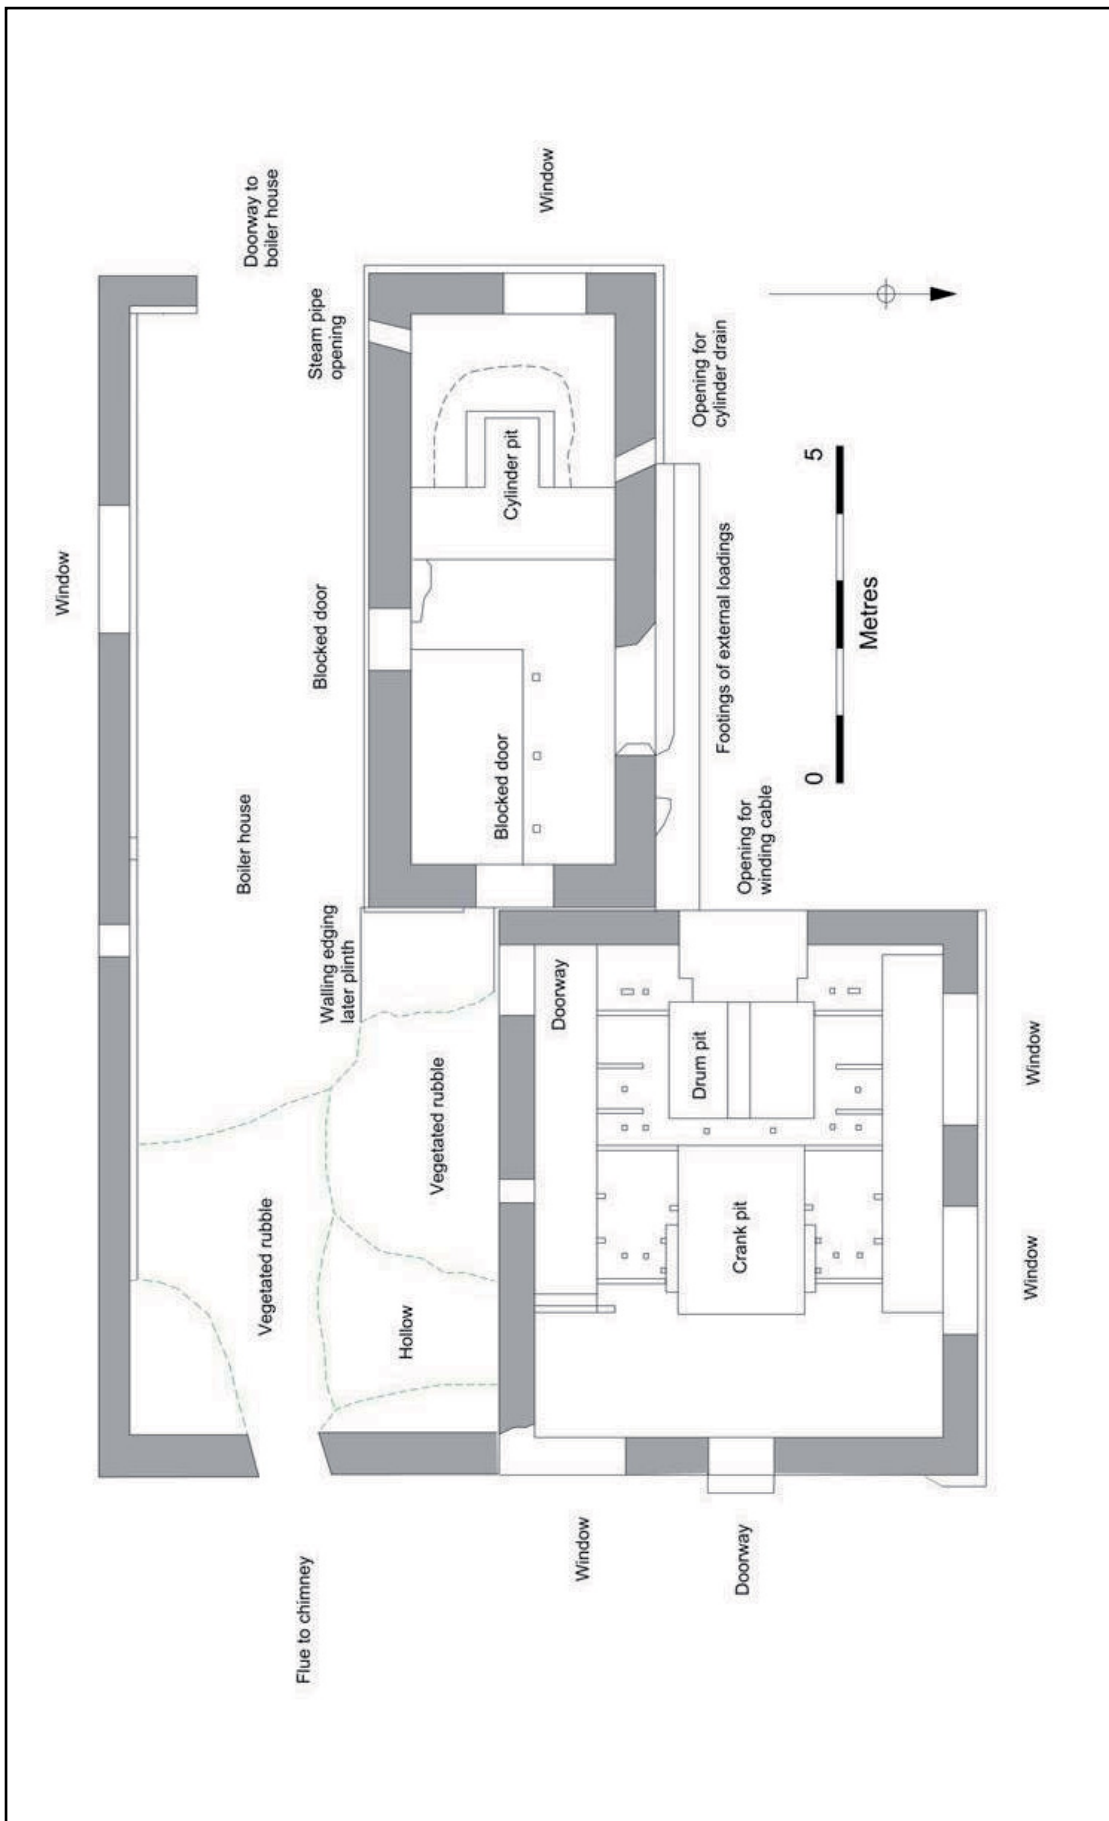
Plan of horizontal winding engine house [190376], boiler house [190377] and all-indoor beam whim engine house [190378] at Wheal Coates.
